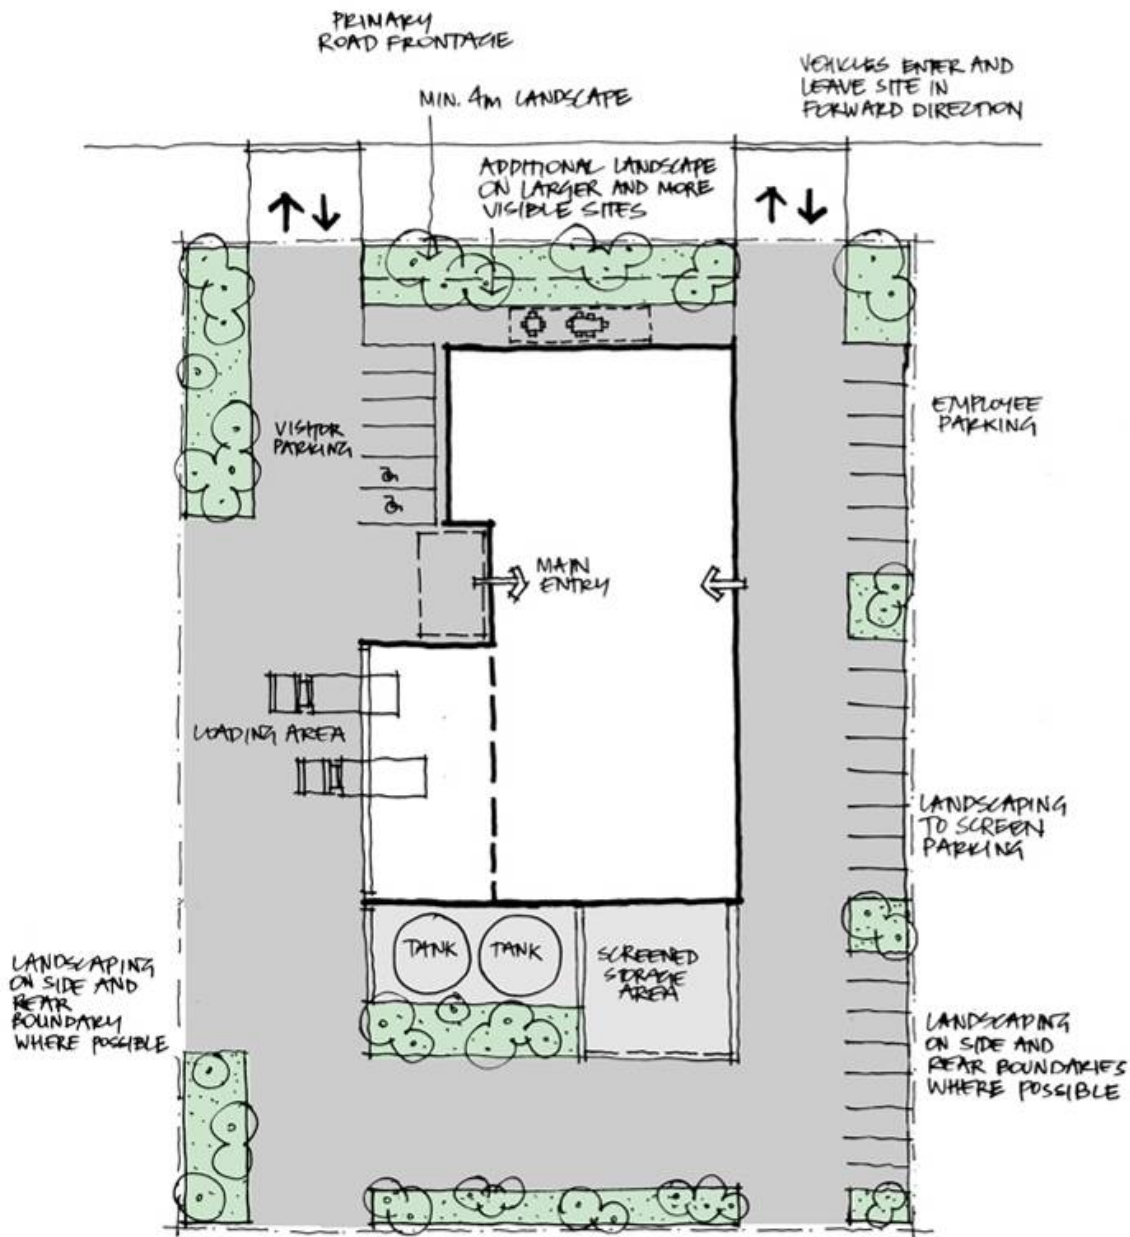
Illustration of Building Setbacks – Larger Site (Plan View)
